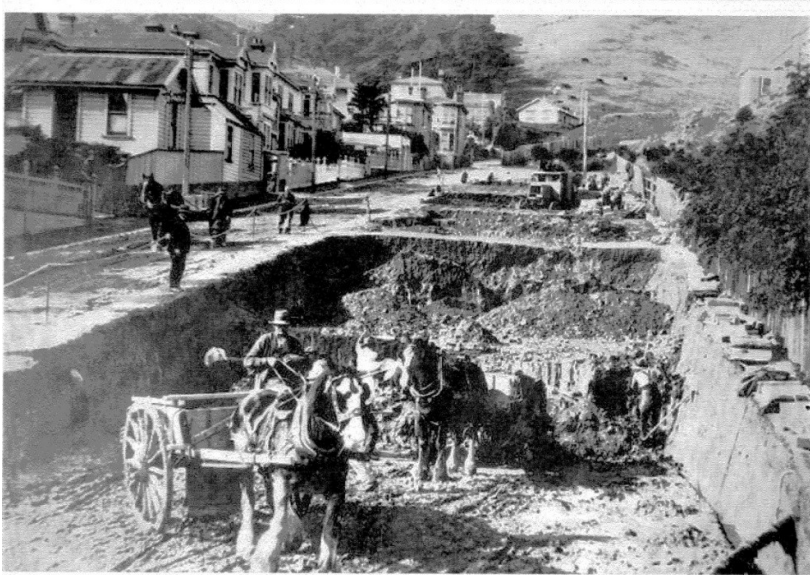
Excavation of approach ramp, Mt Victoria side⁸⁶
